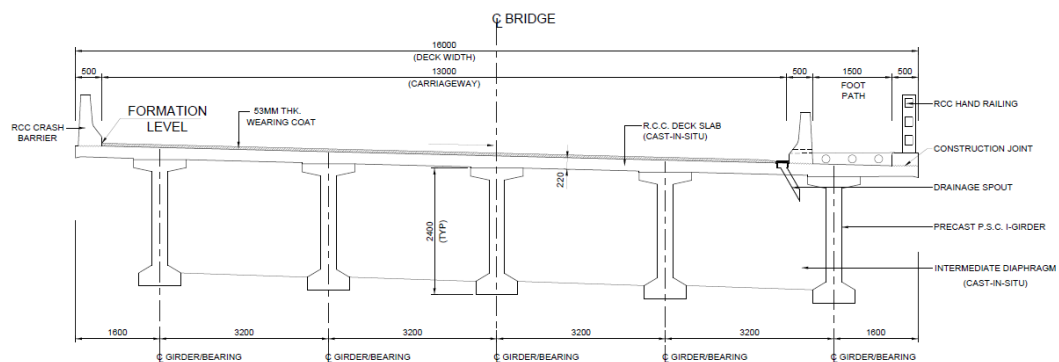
15 Cross section of 40m span OC post tensioned I girder at mid span
